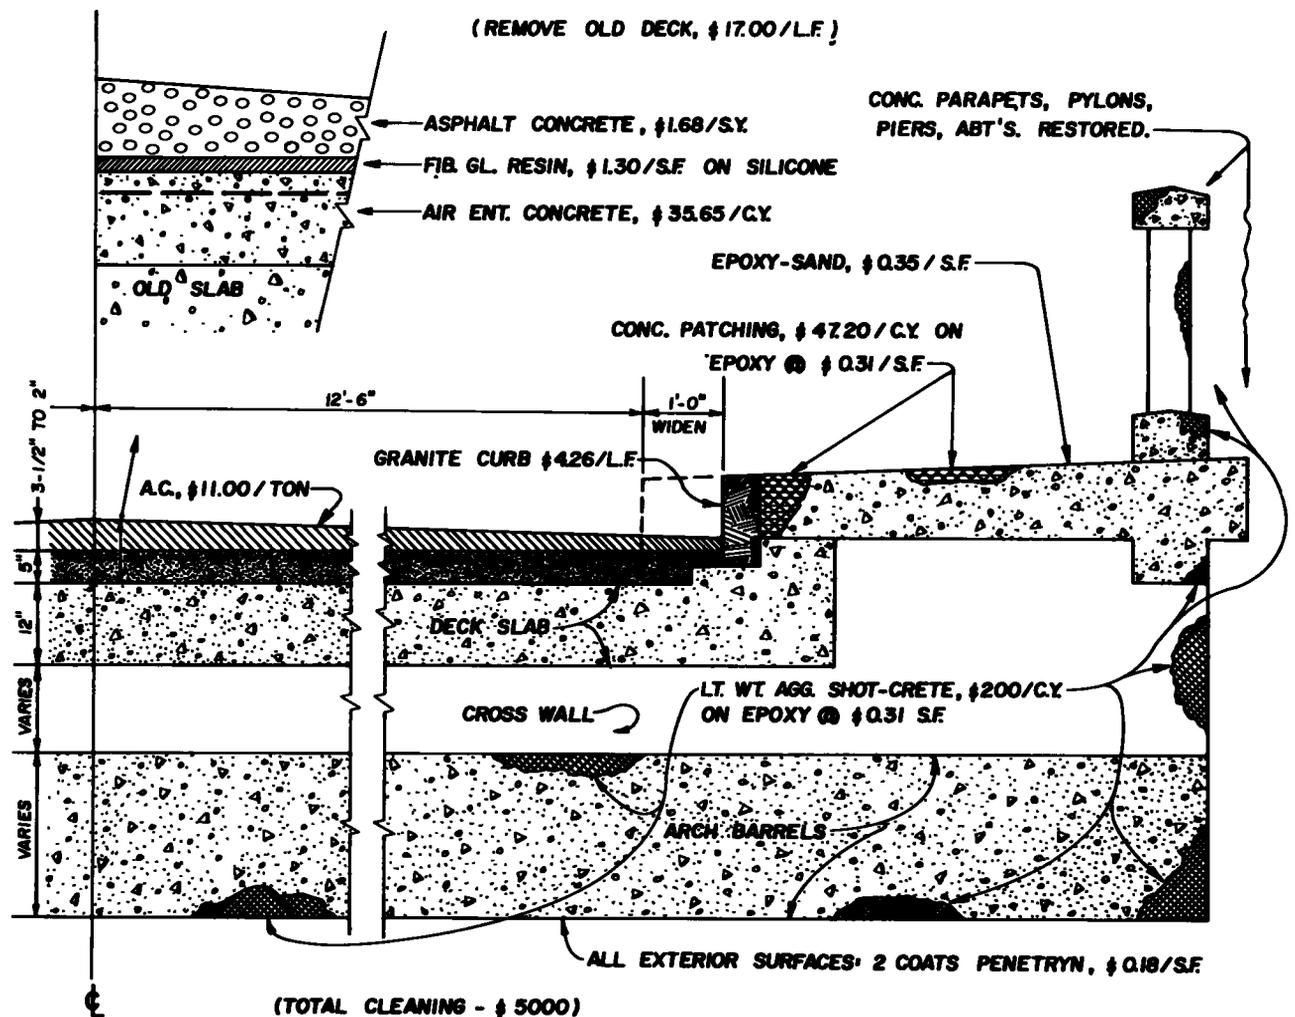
Section of arch structure deck with restoration details and costs, Troy, N.Y.
